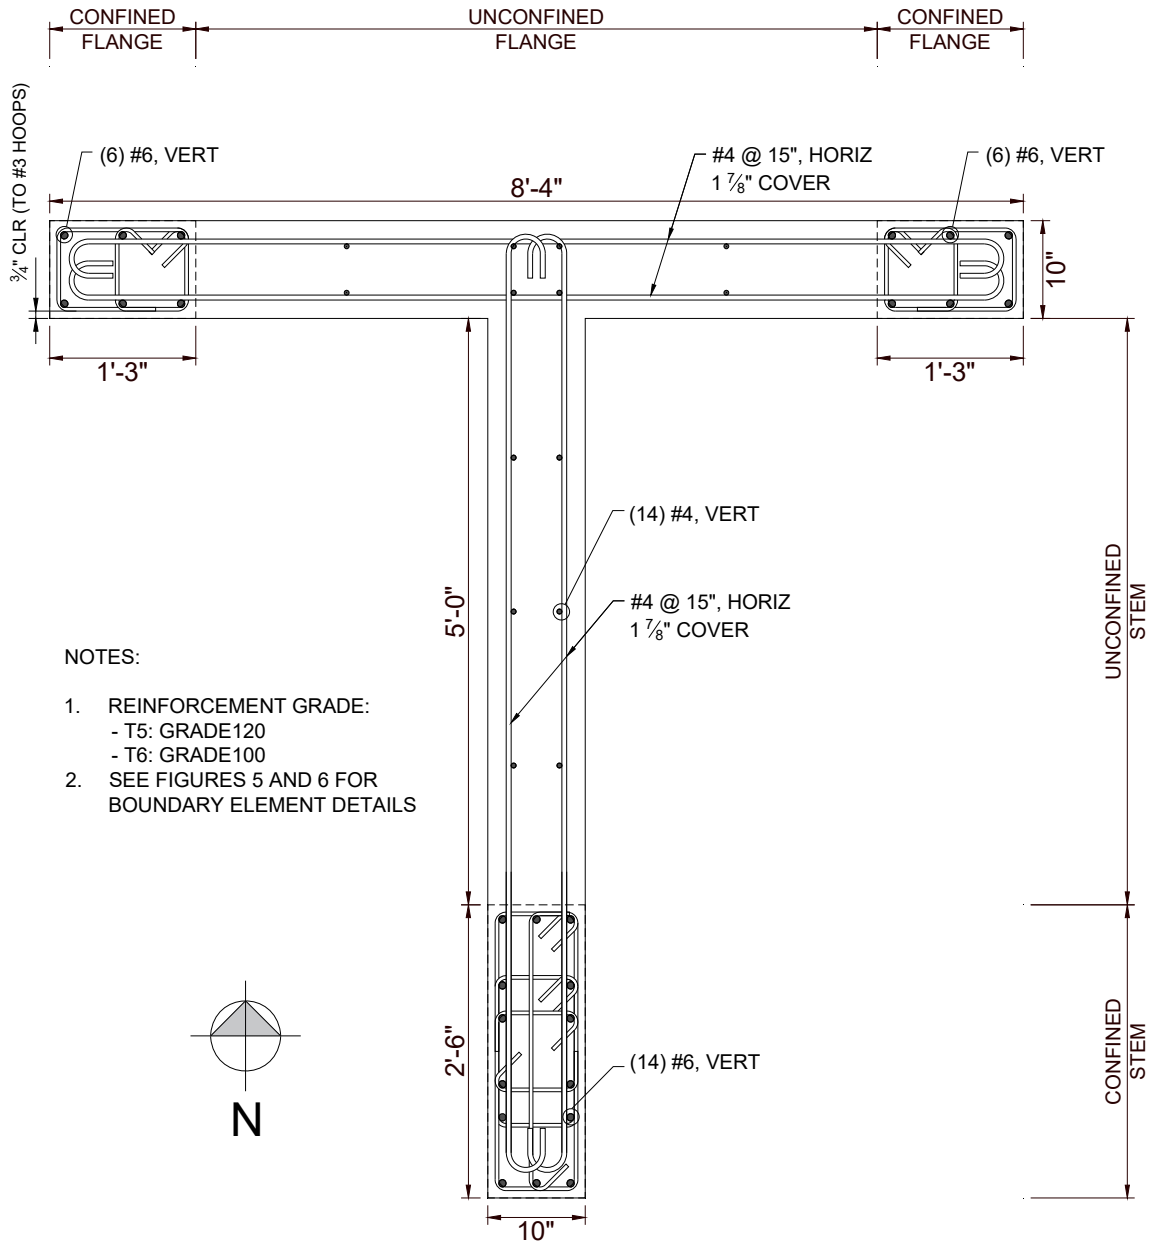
Reinforcement layout for wall T5 and T6 (1 in. = 25.4 mm)
